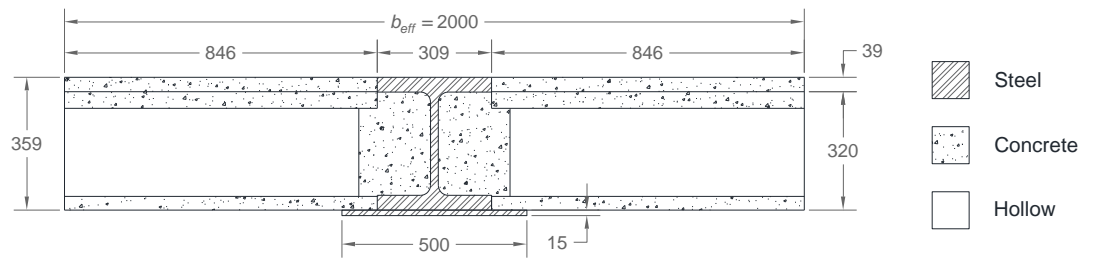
Slim floor beam cross-section with effective part of HCS and concrete (Example 1)
